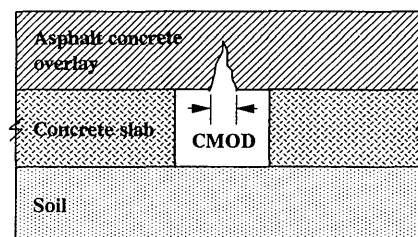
Crack mouth opening displacement (CMOD) in the concrete pavement system.
